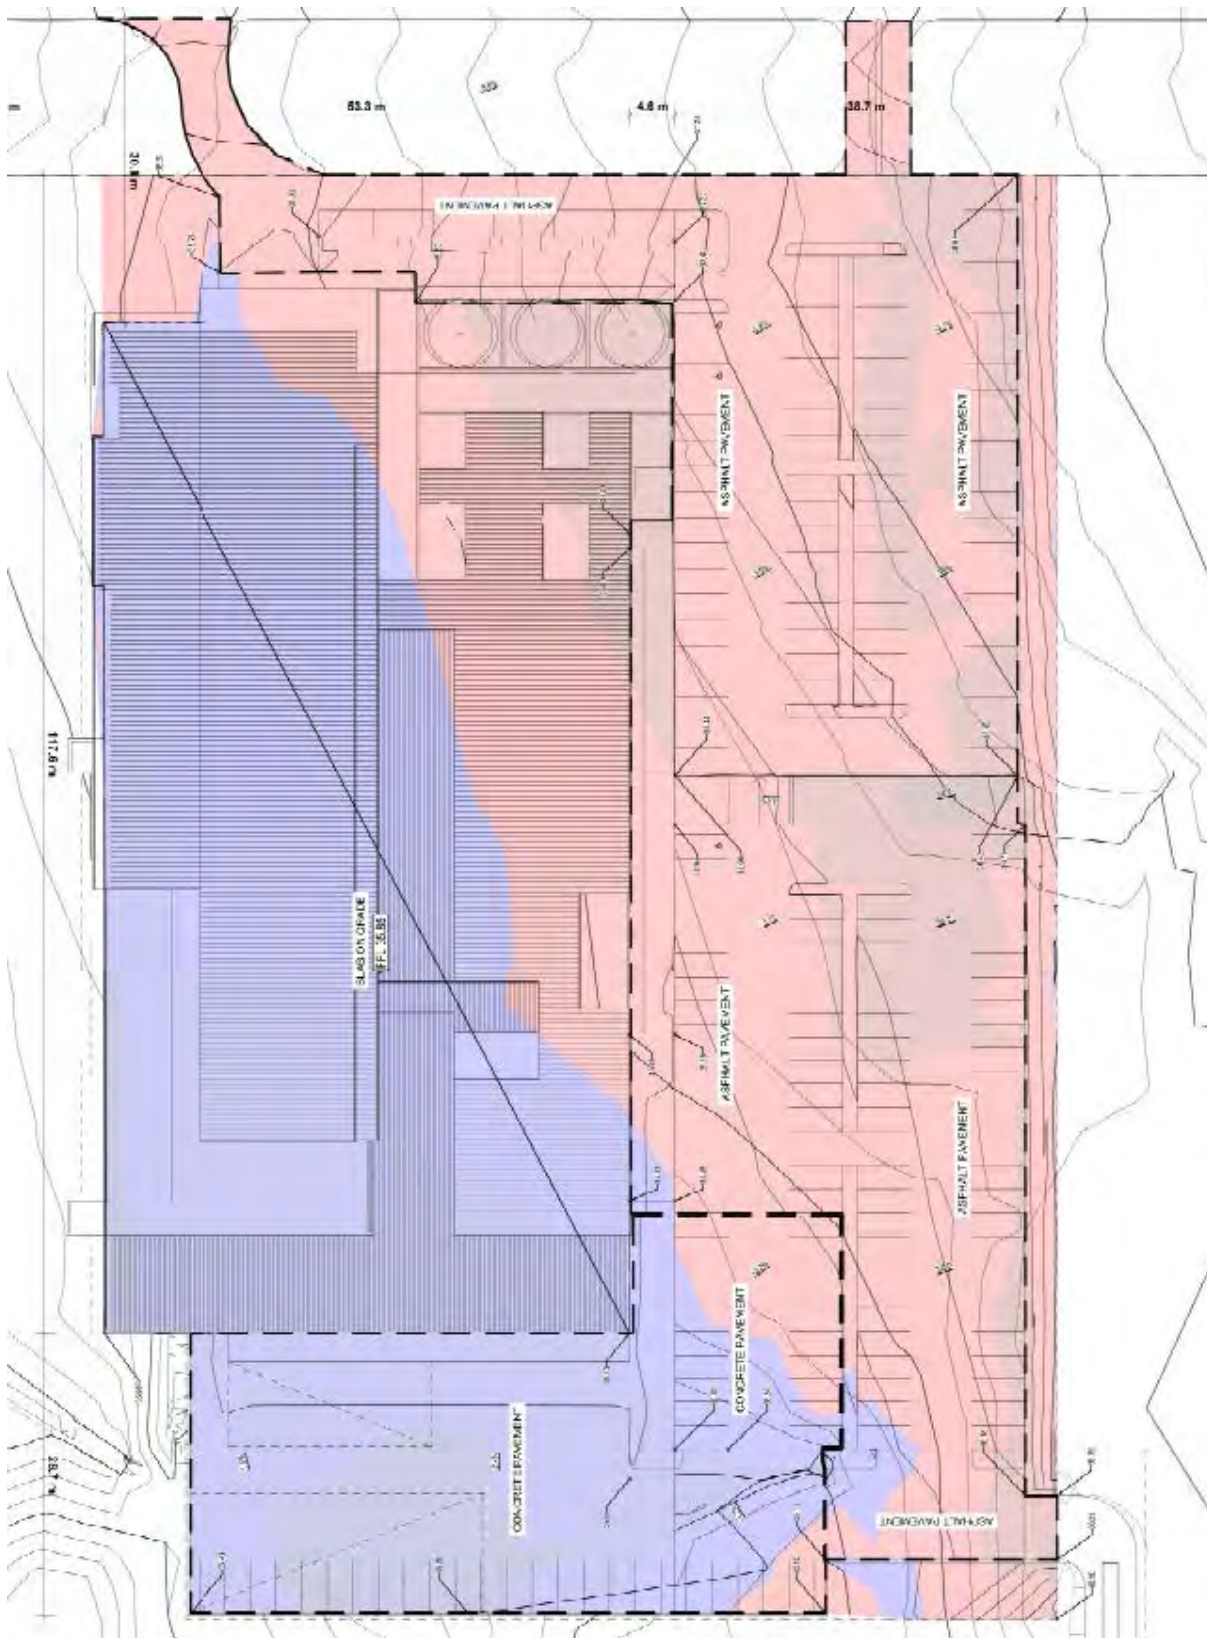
Stage 1 - FPCC Site Proposed Layout (Source: Cardno, 2016)
